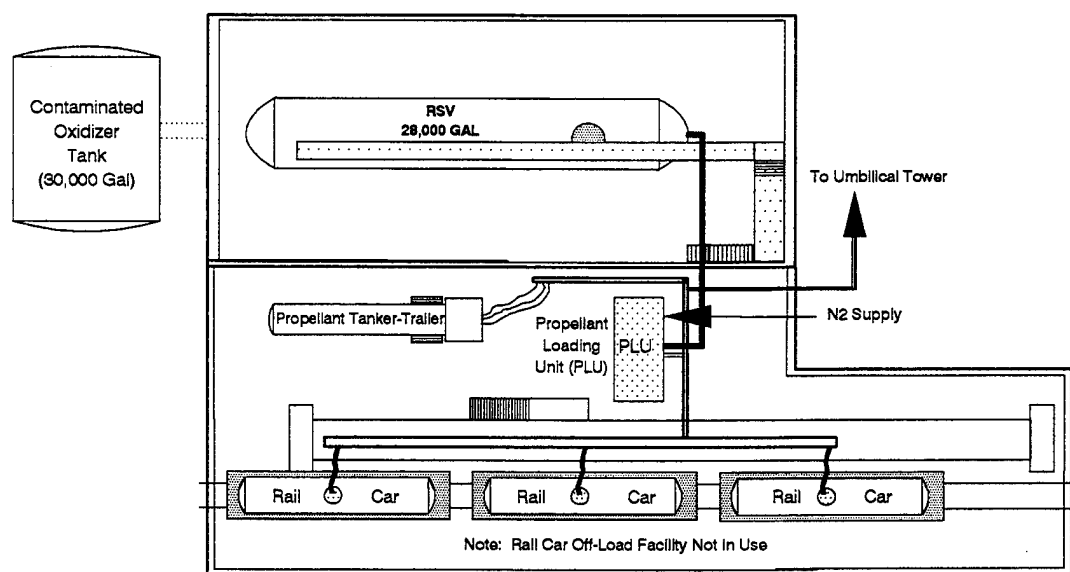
CCAS Titan Oxidizer Holding Area (OHA) Site Plan.
